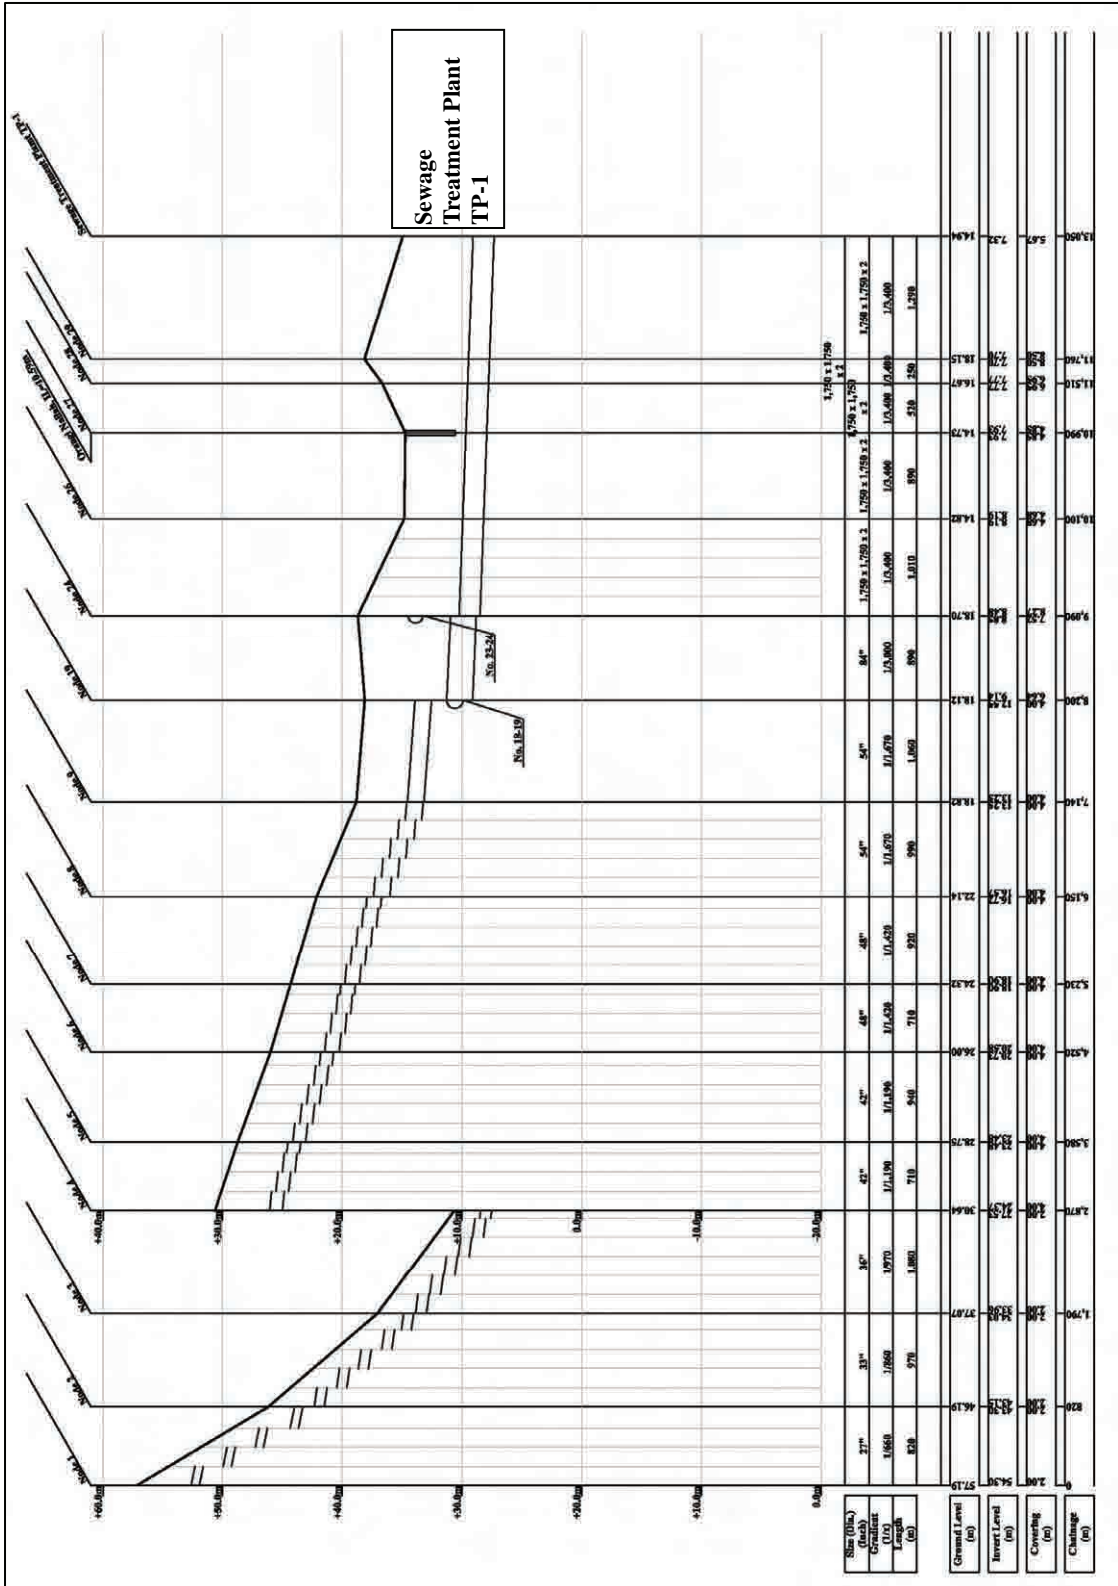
Longitudinal Section of Trunk Sewer and Sub-main Sewer (1/4)
